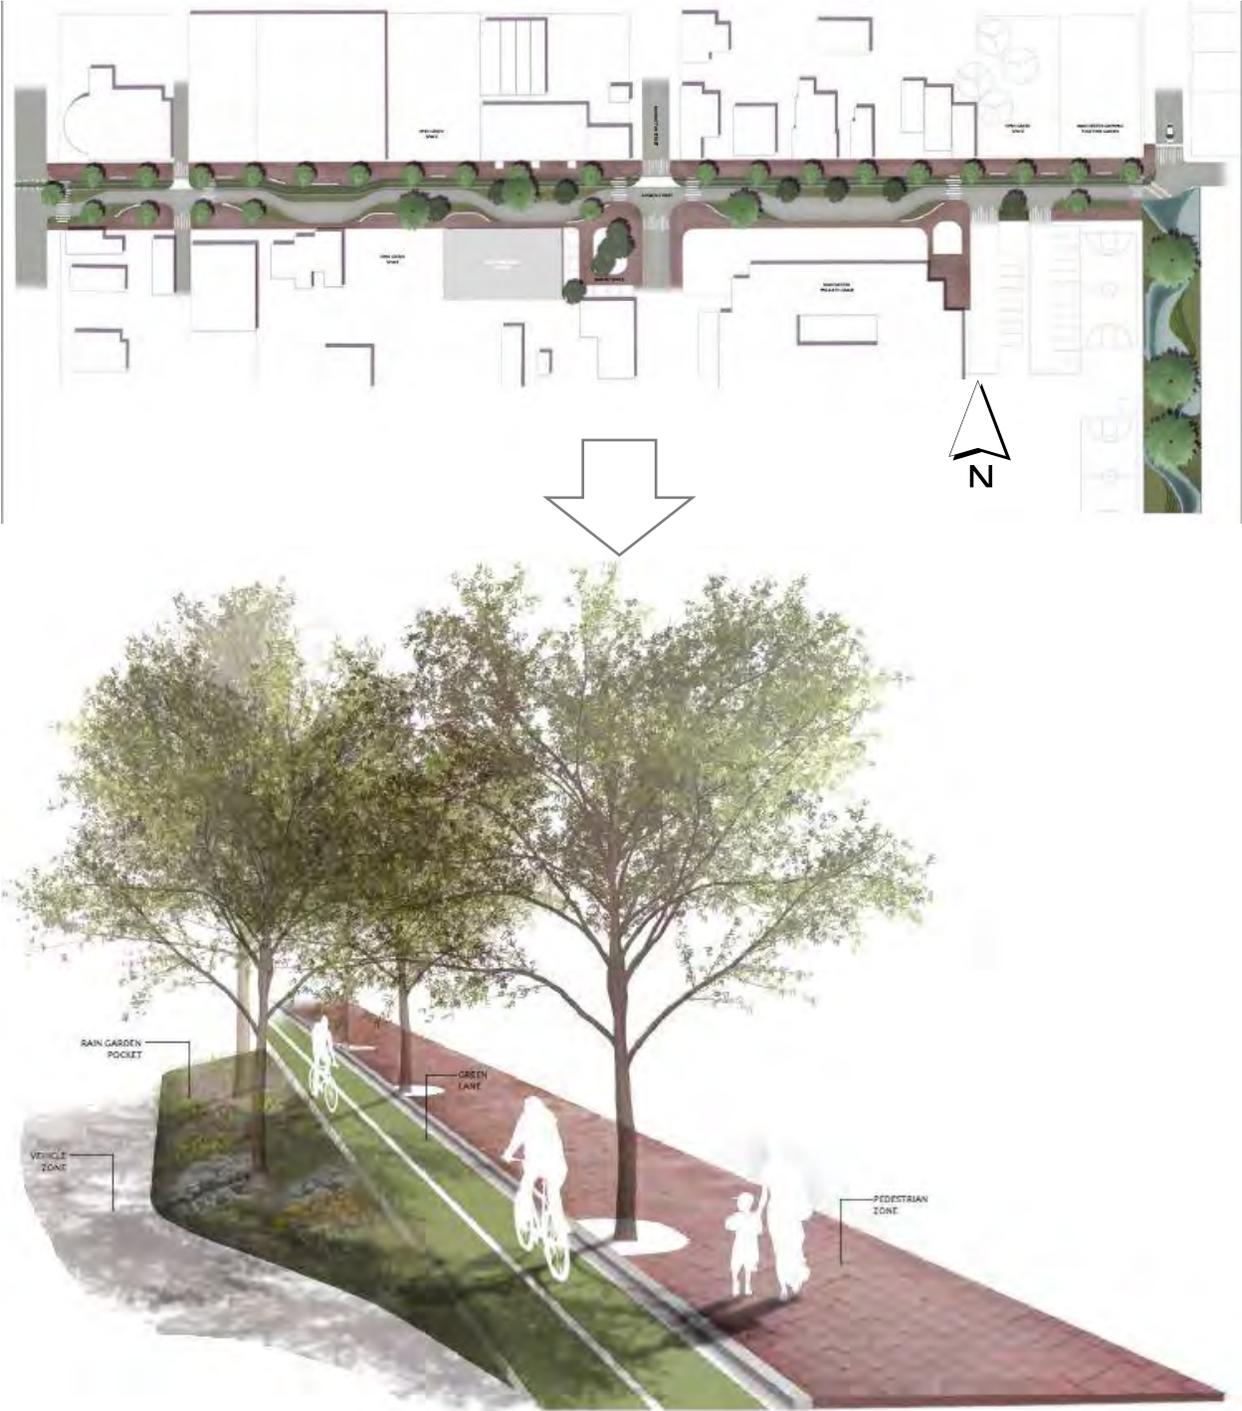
The Greenway Connection on Site 2 (Hamlin Park Neighborhood)
